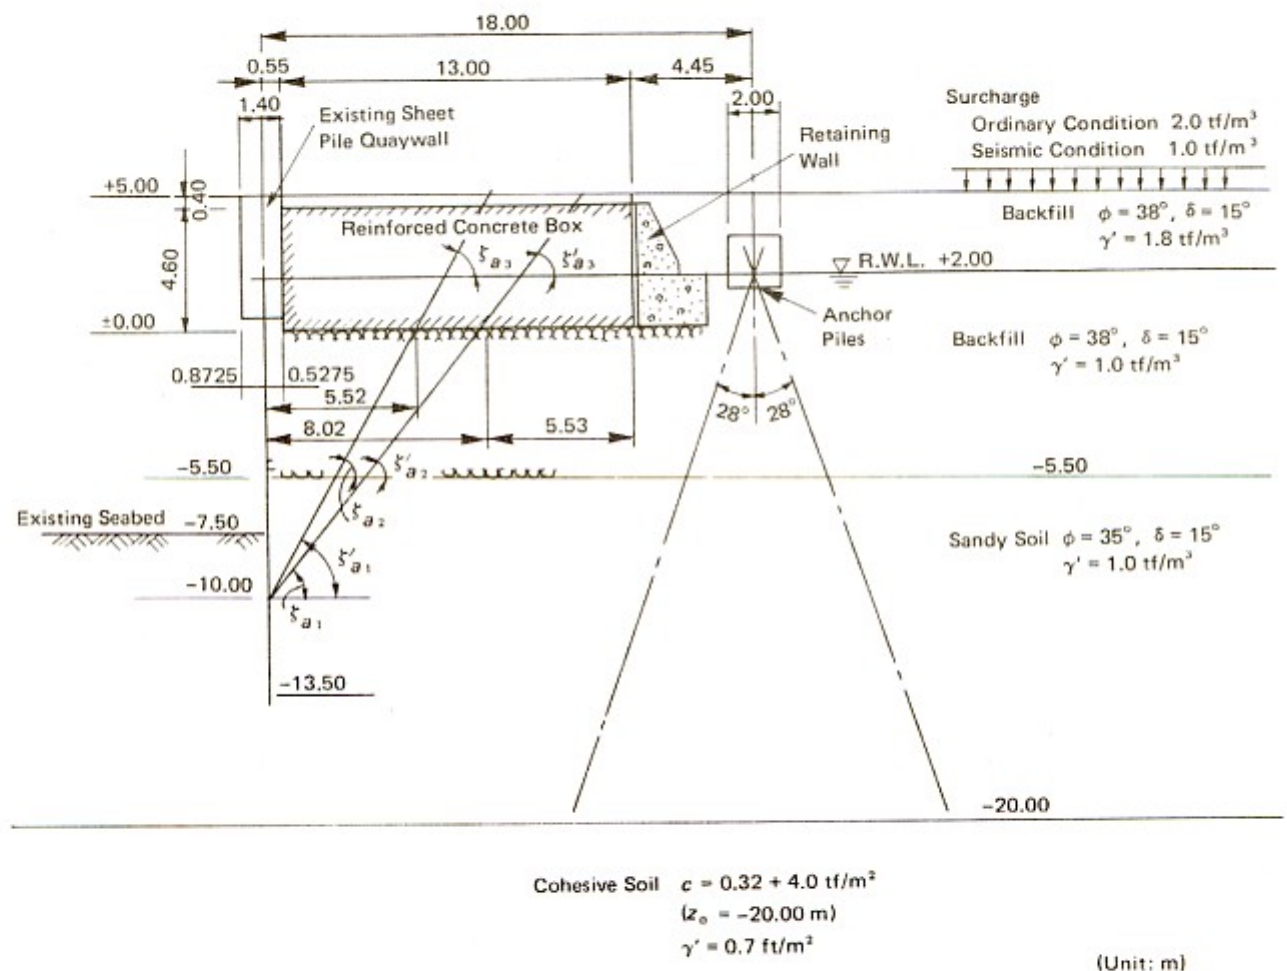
Examination of the Possibility Increasing the Water Depth of the -7.5 m Quaywall (Replacement of Backfill with Light Weight Concrete Box)
